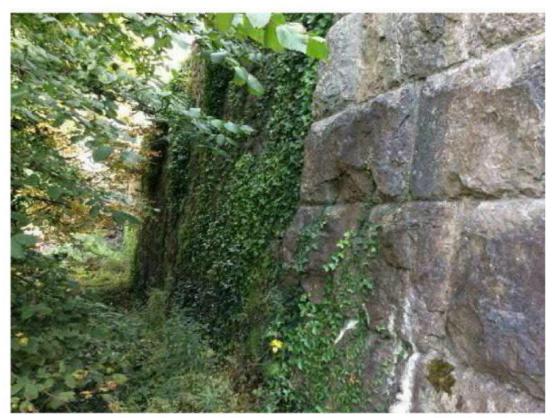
Wing walls - Ivy to lower parts of south end of south east wing wall
